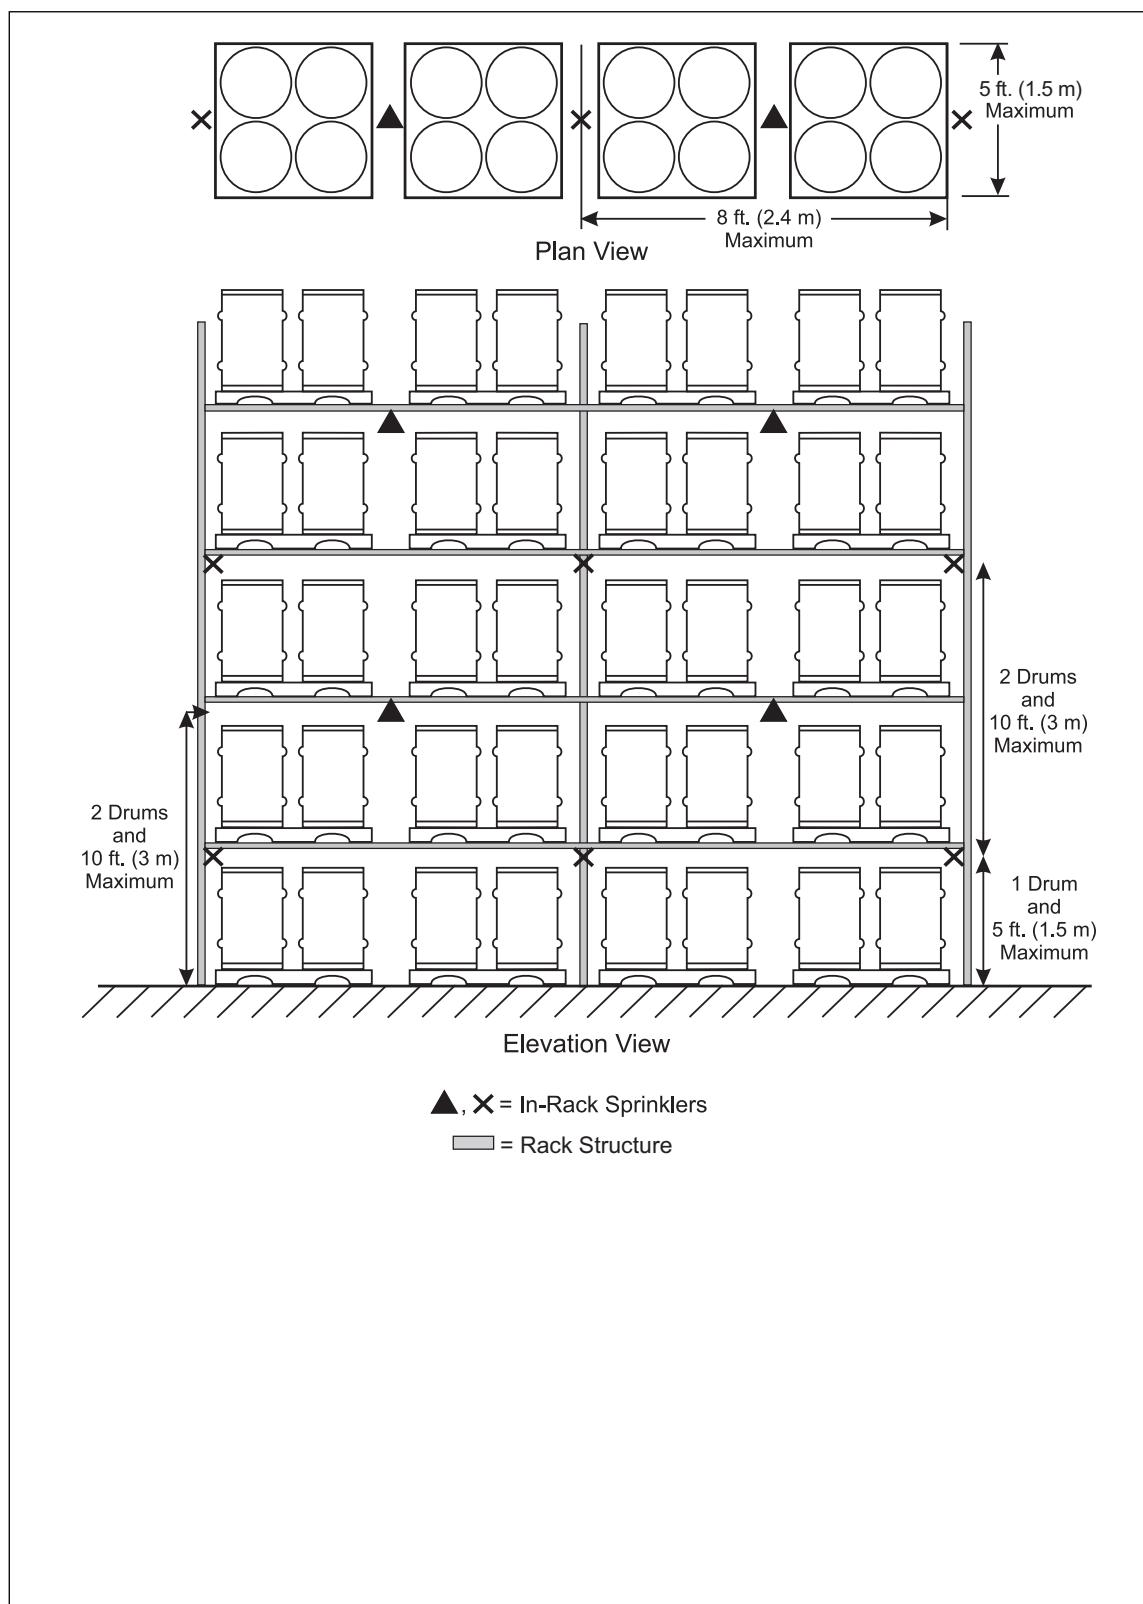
Single-row rack sprinkler layout: drum protection scheme
